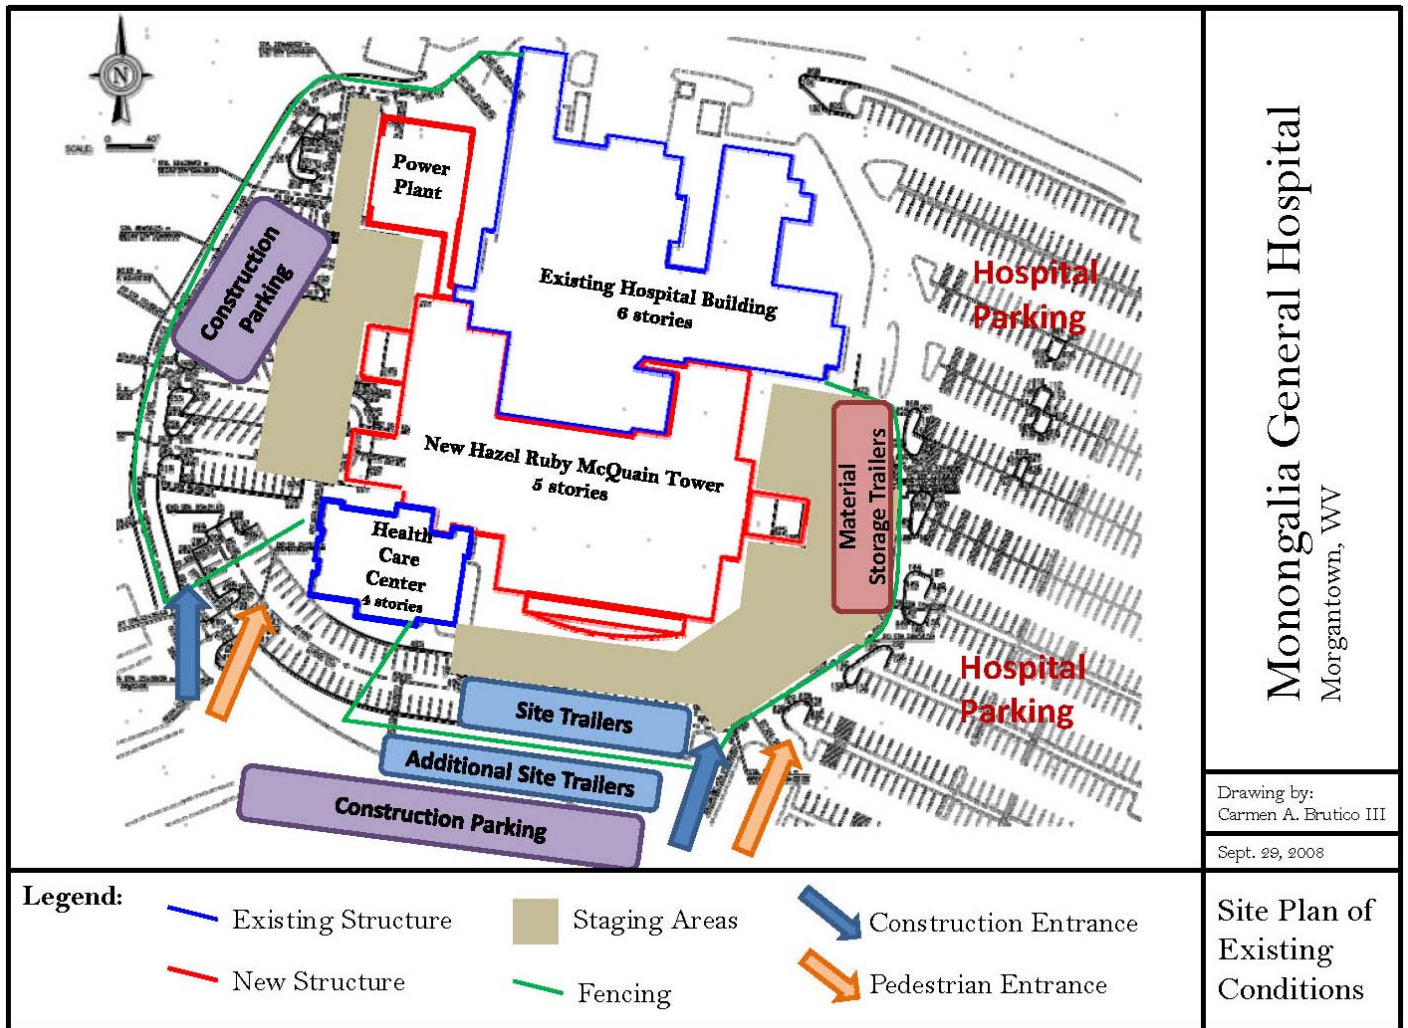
Site Plan of Existing Conditions for the Monongalia General Hospital Renovation and Addition Project
